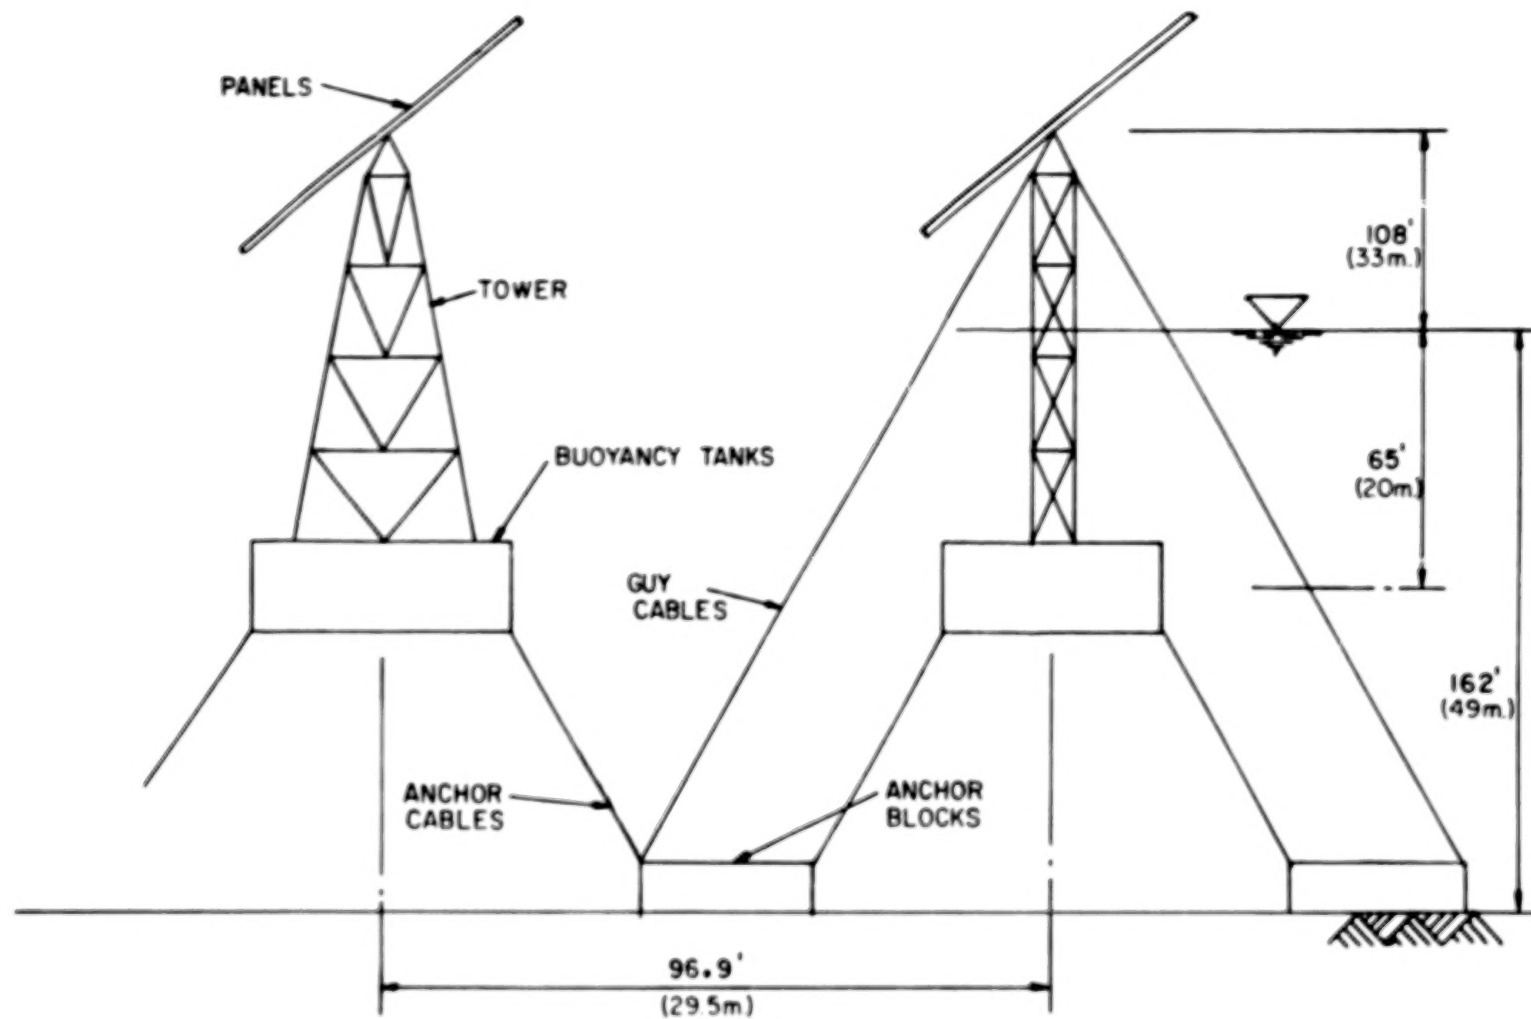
SUBMERGED BUOYANT PLATFORMS
